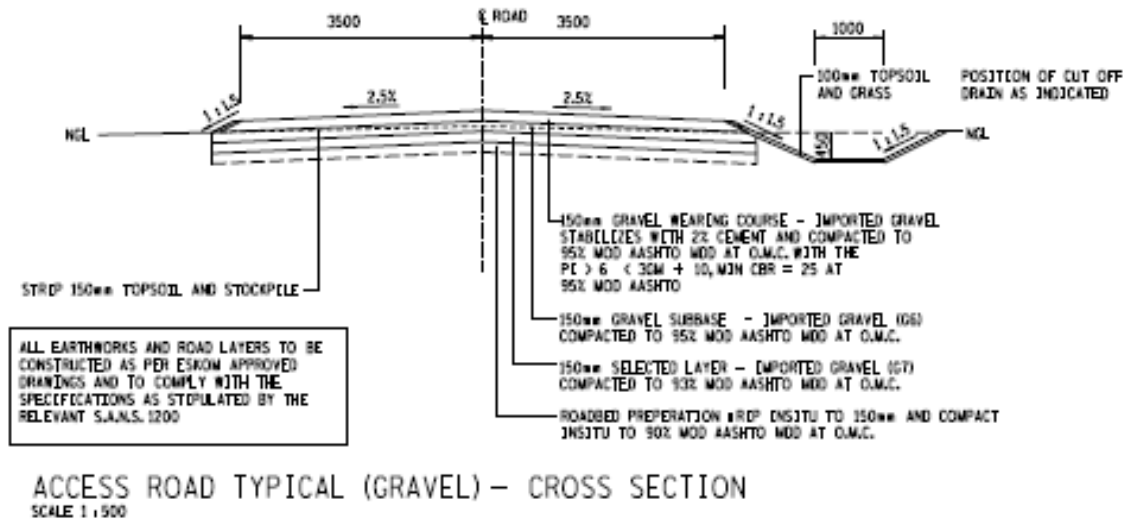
The minimum ESKOM Standard for access roads for extra heavy loads into ESKOM facilities (taken from ESKOM Typical Access Road Cross Section Drawing).
